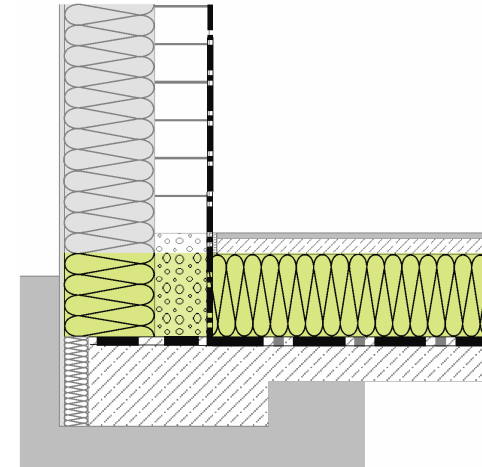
16 – Insulation above the floor slab. The load-bearing wall is placed on a layer of porous concrete to reduce the thermal bridge effect
